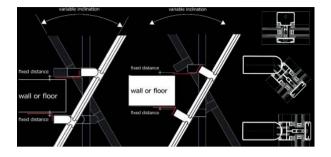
Varying connecting angle of façade to superstructure (e.g. columns, walls, floors)
